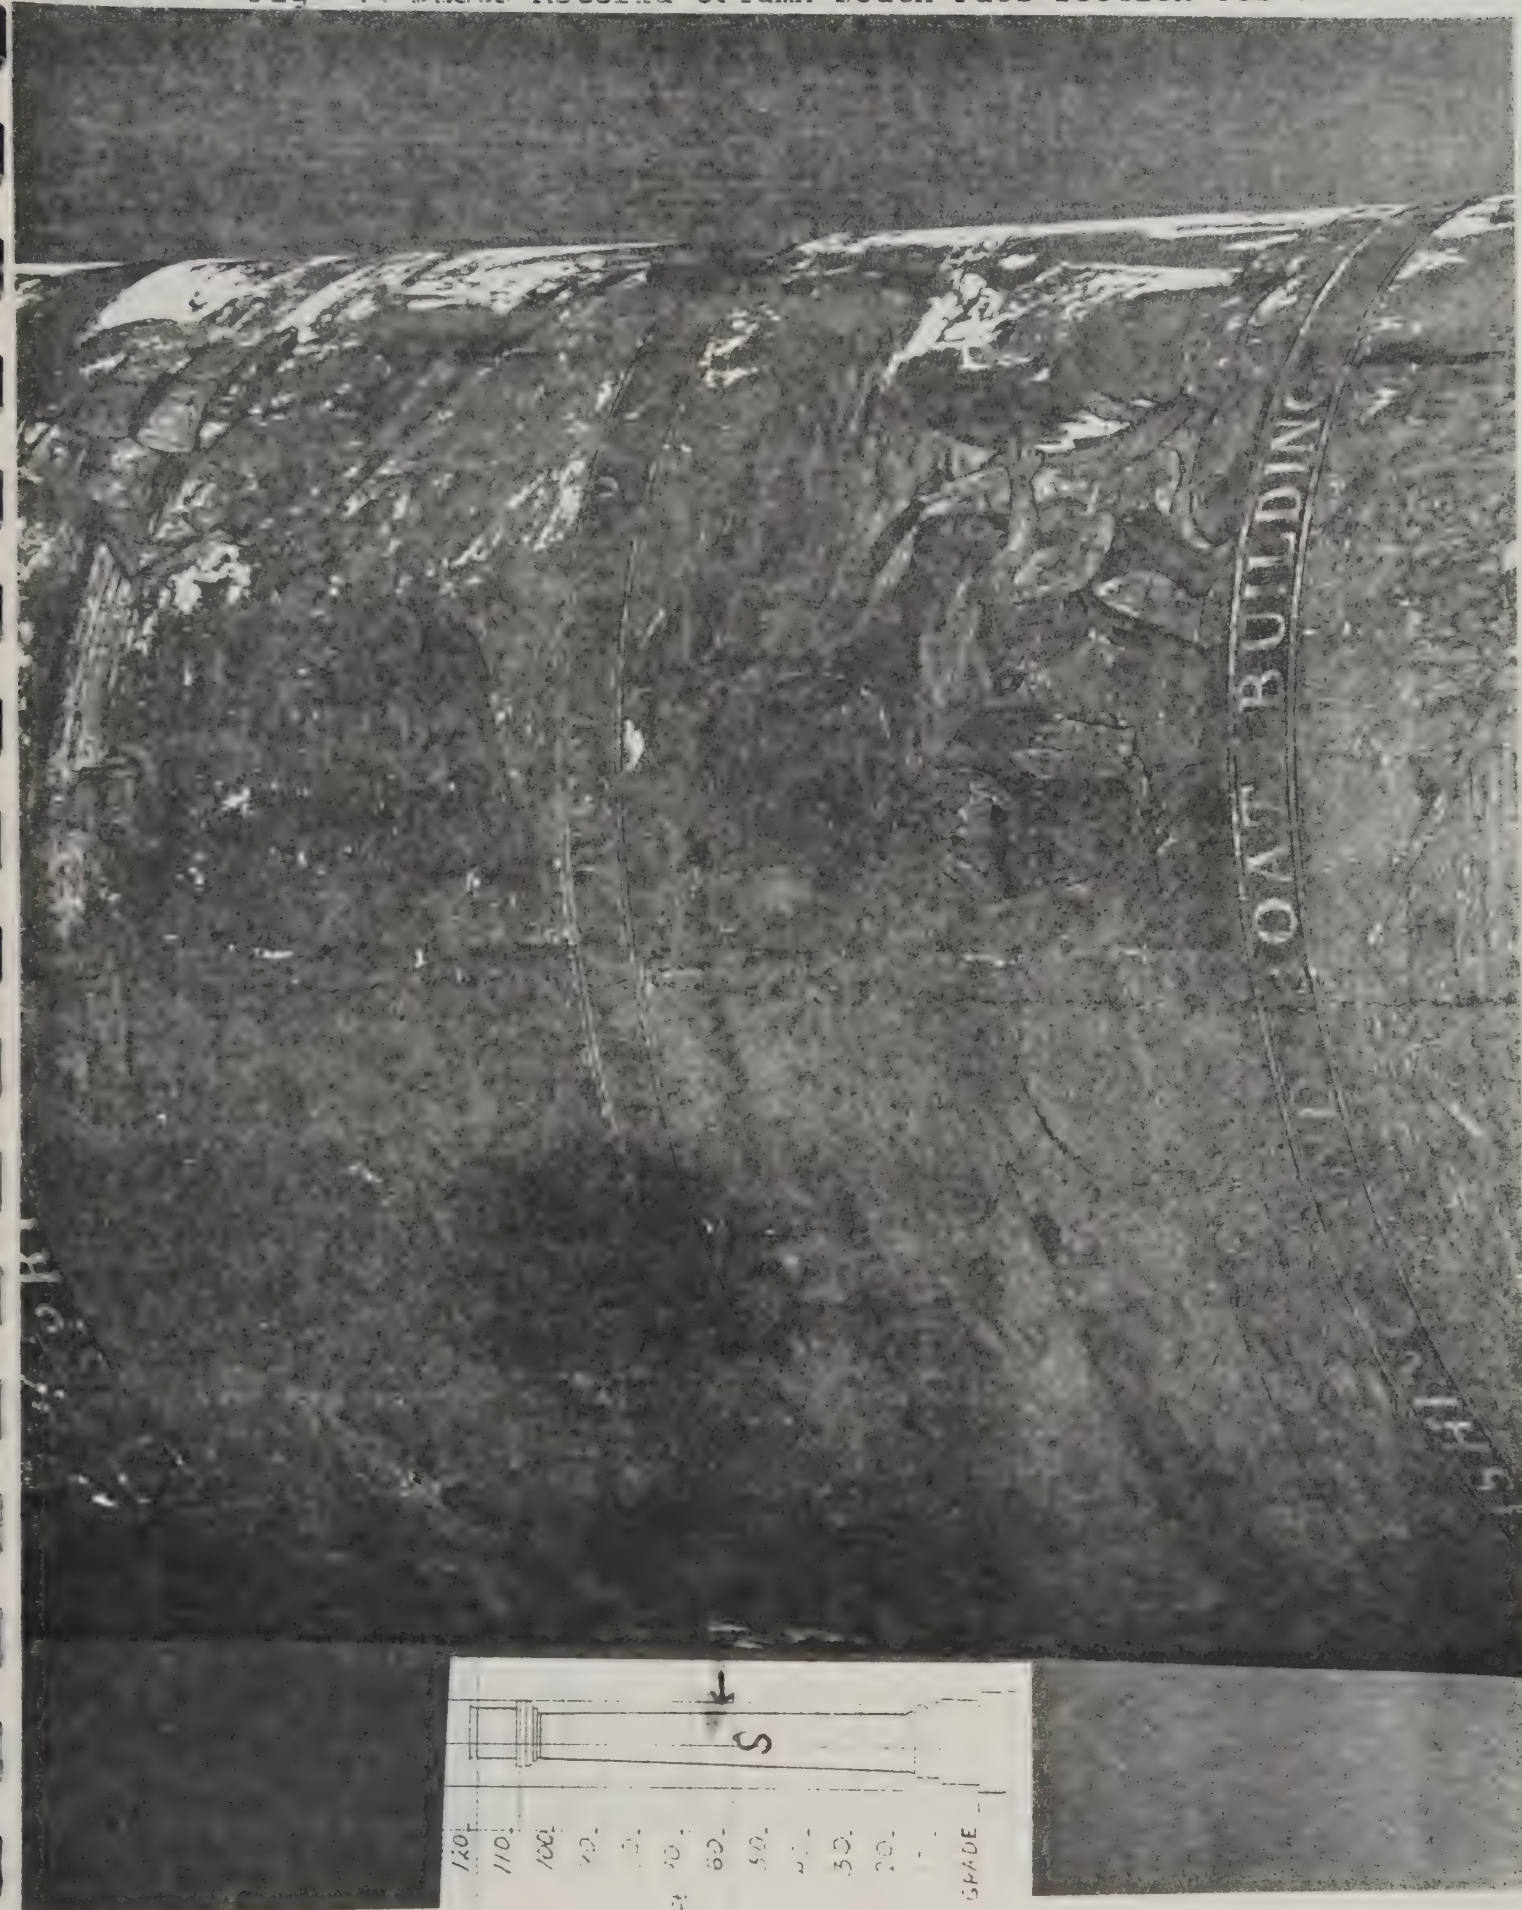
Photo Astoria Column South Face Section-OCT 1989
